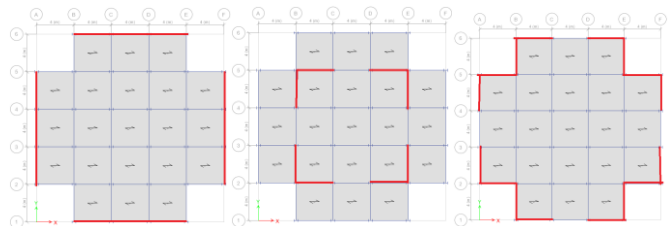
Plus shaped building showing braces located on faces, internally, at corners Model 3A), 3B), 3C) respectively
